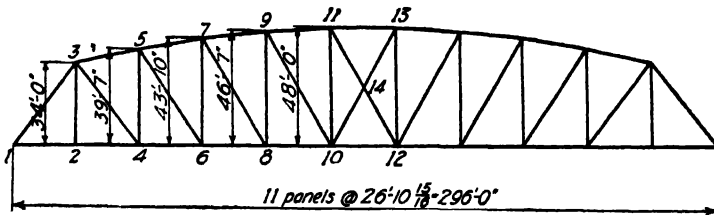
Truss Diagram of a 296-foot, Single-track-railway, Riveted, Parker-truss Span.
